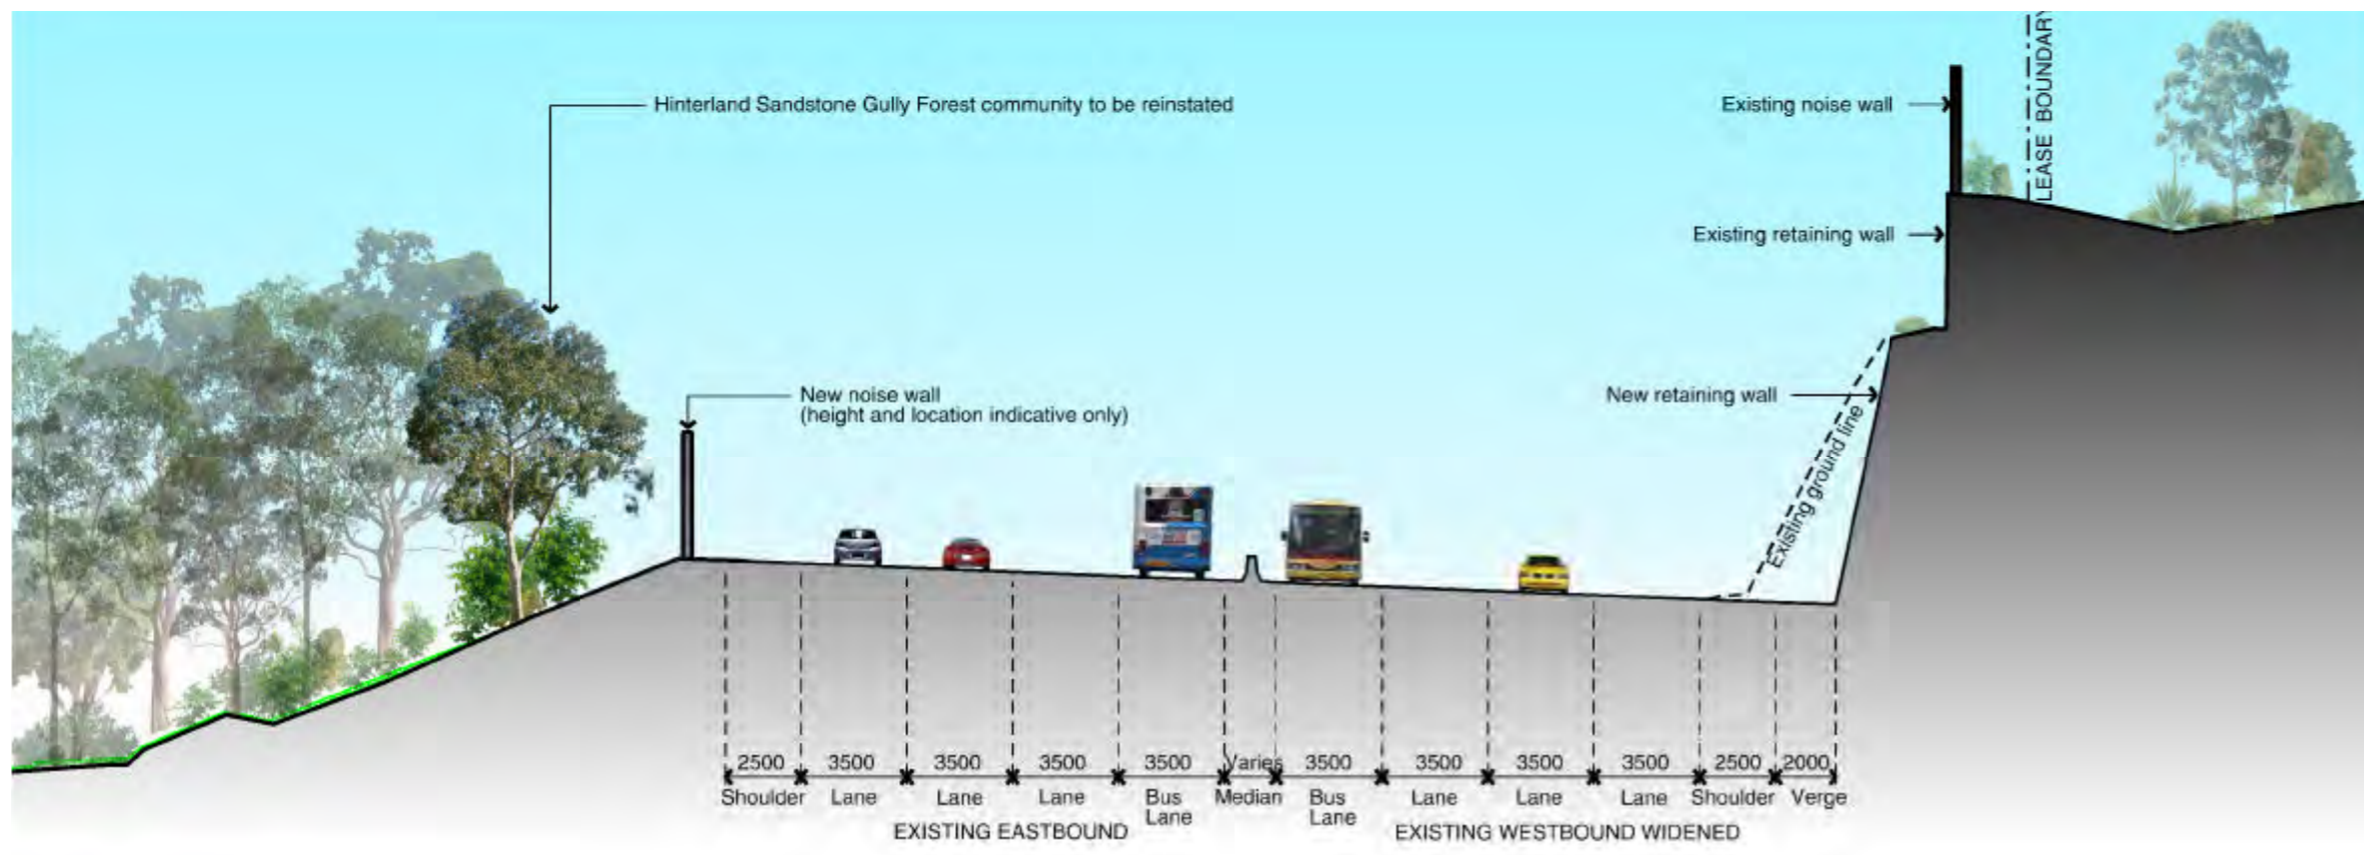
Stn 10350 Large cut with shotcrete - Proposed
